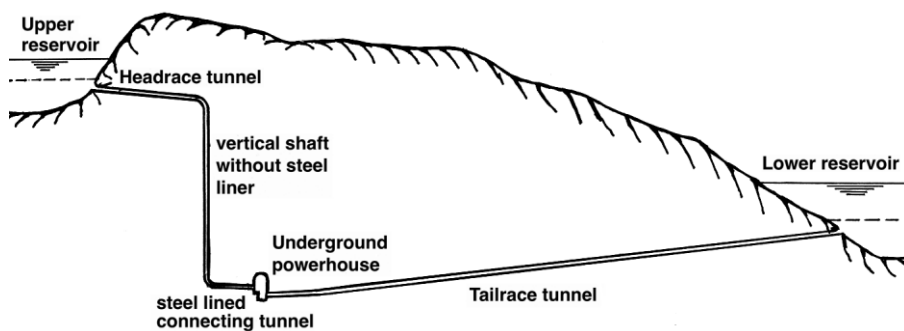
Longitudinal profile of a typical waterway system of a pumped storage station with a vertical shaft between the two reservoirs
